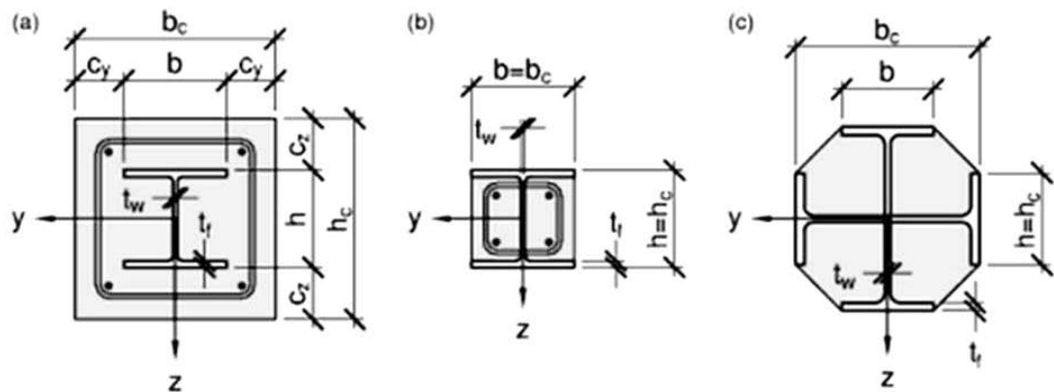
Typical Cross-Section of Composite Columns with Fully or Partially Concrete-Encased H-Section
